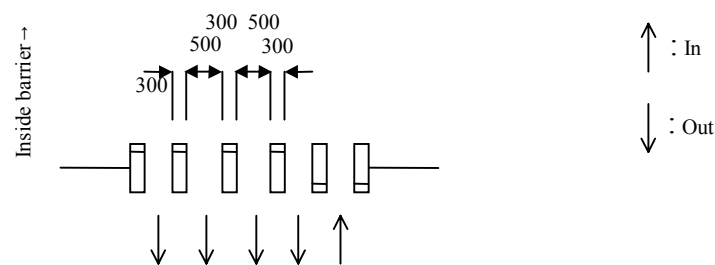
Preliminary Plan of Automatic Barrier (existing facilities dimensions)
